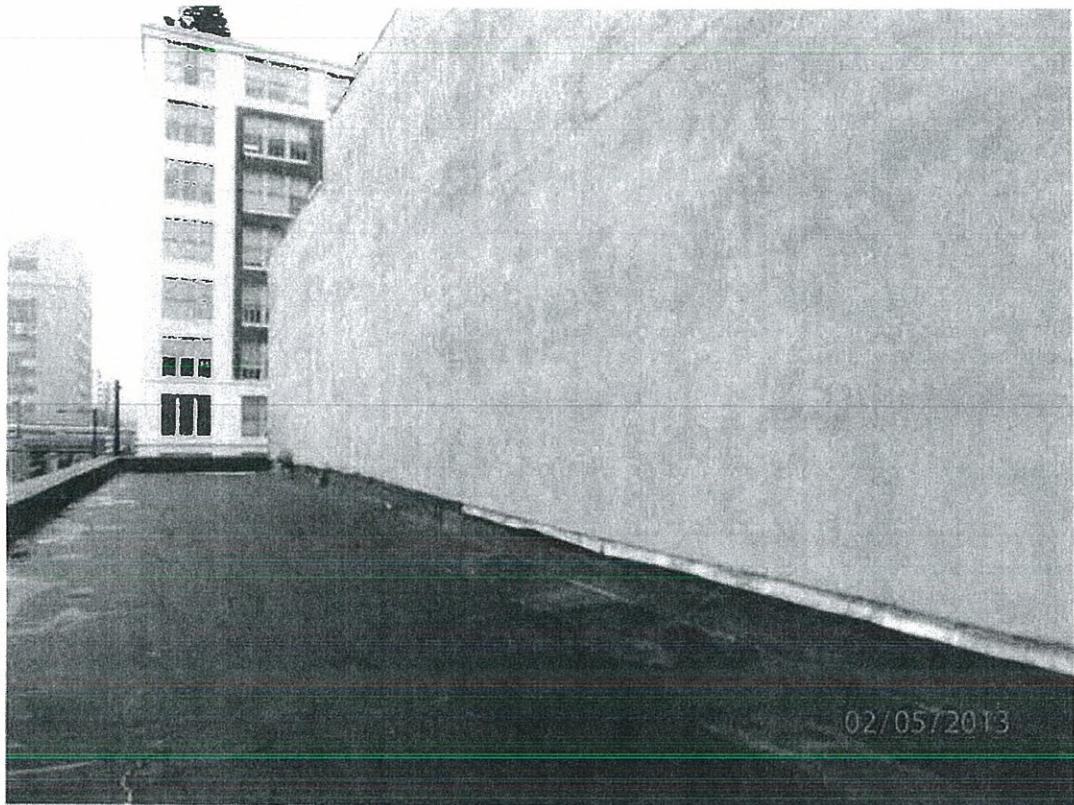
Roof View 2140 Market Street, Philadelphia, PA
